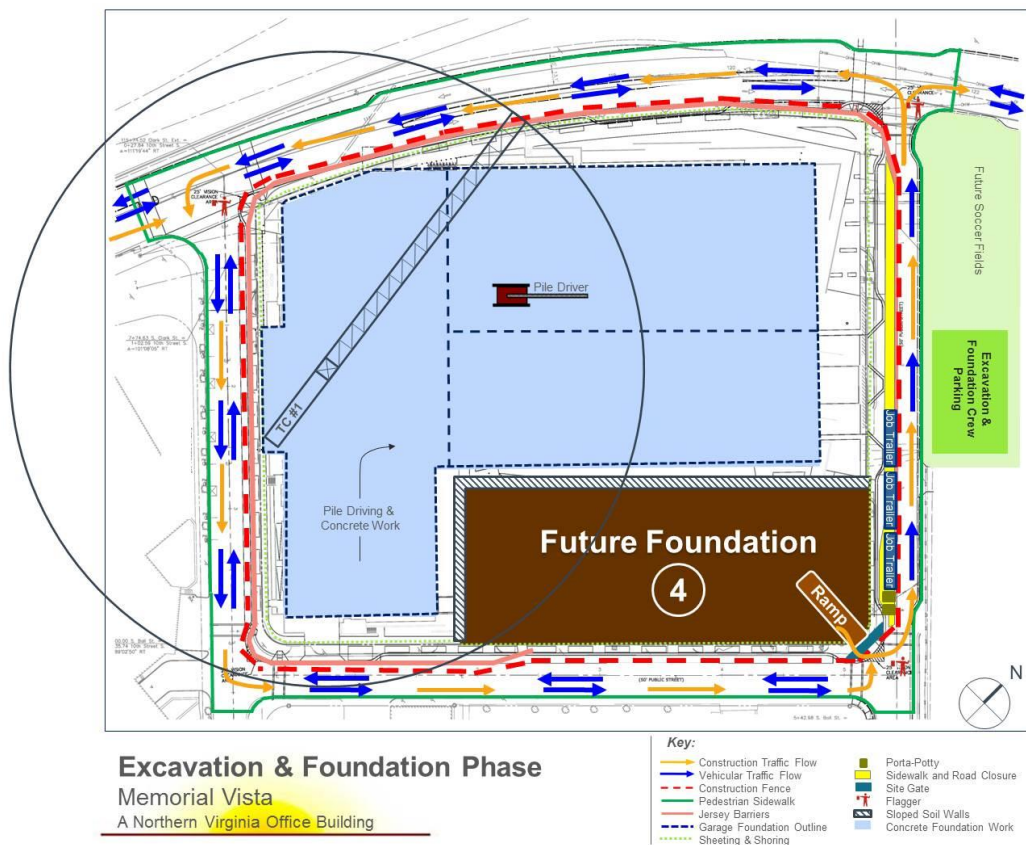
Building Excavation Phase Site Plan (Original Drawing Underlay Courtesy of Gensler)
